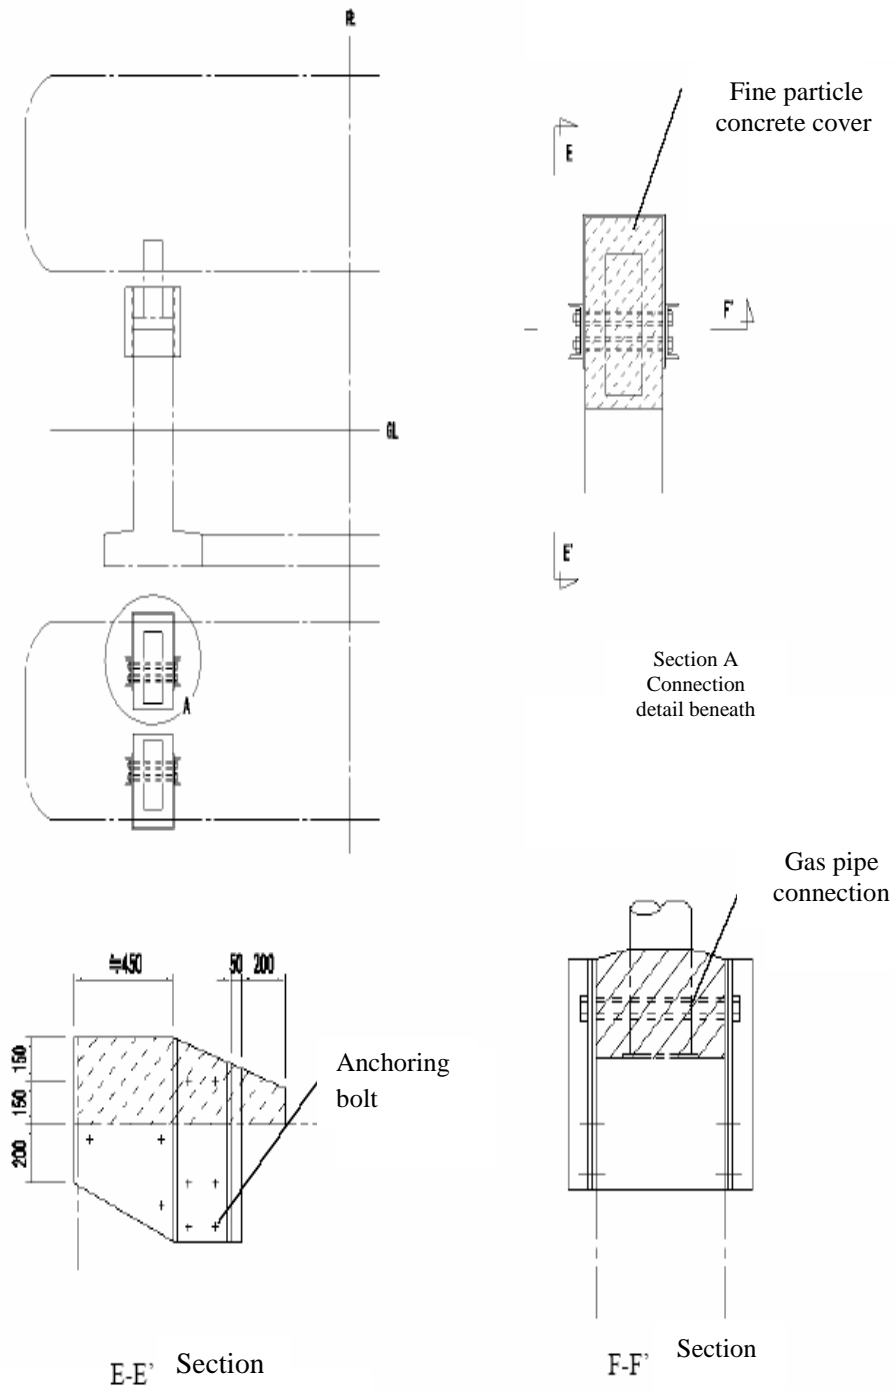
Seismic retrofitting of anchored bolts with extension of restraint length in concrete (a)
